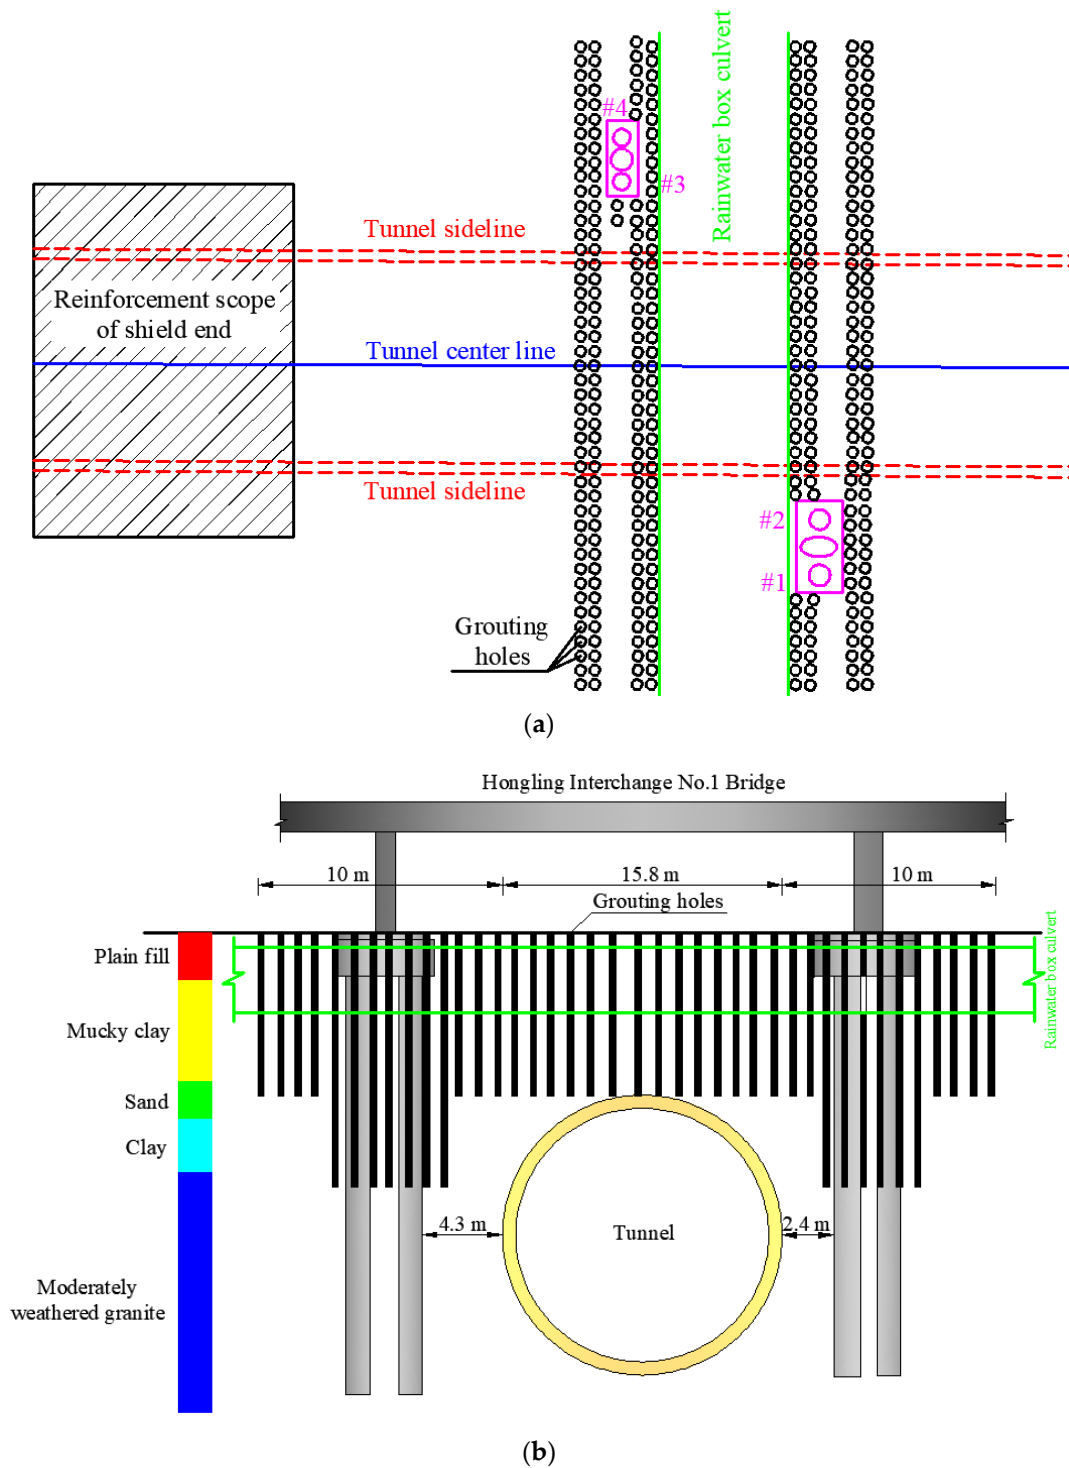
Grouting reinforcement scheme. (a) Plan of the grouting reinforcement scheme. (b) Section of the grouting reinforcement scheme.
